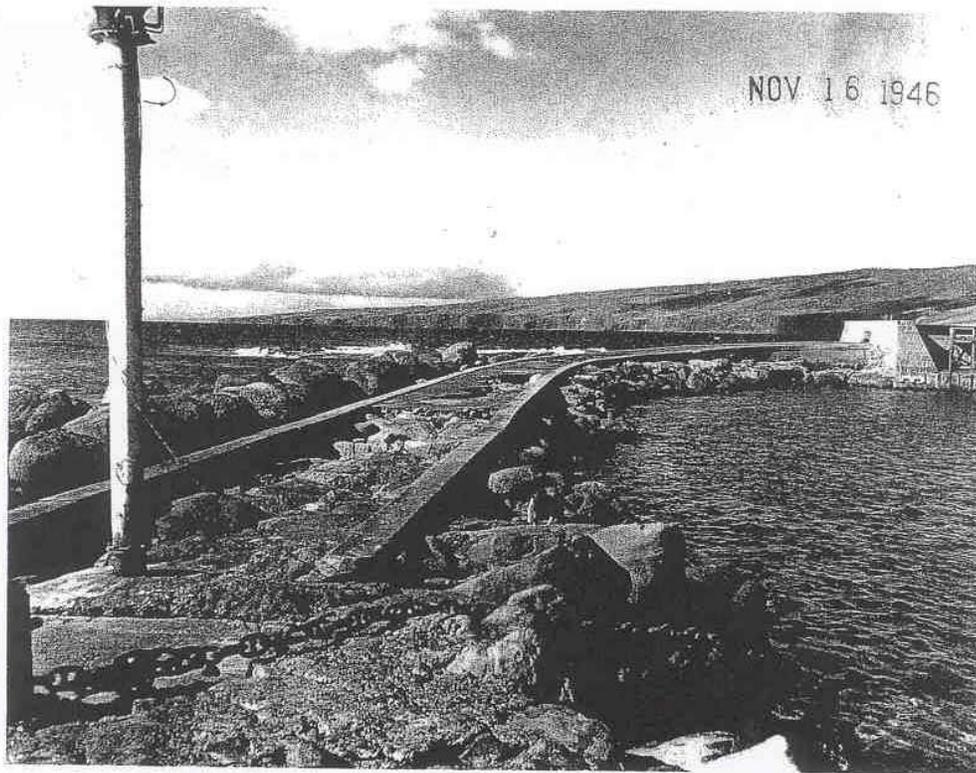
(a-b) Breakwater and Stone Wall surrounding Kaumälapa'u Harbor
